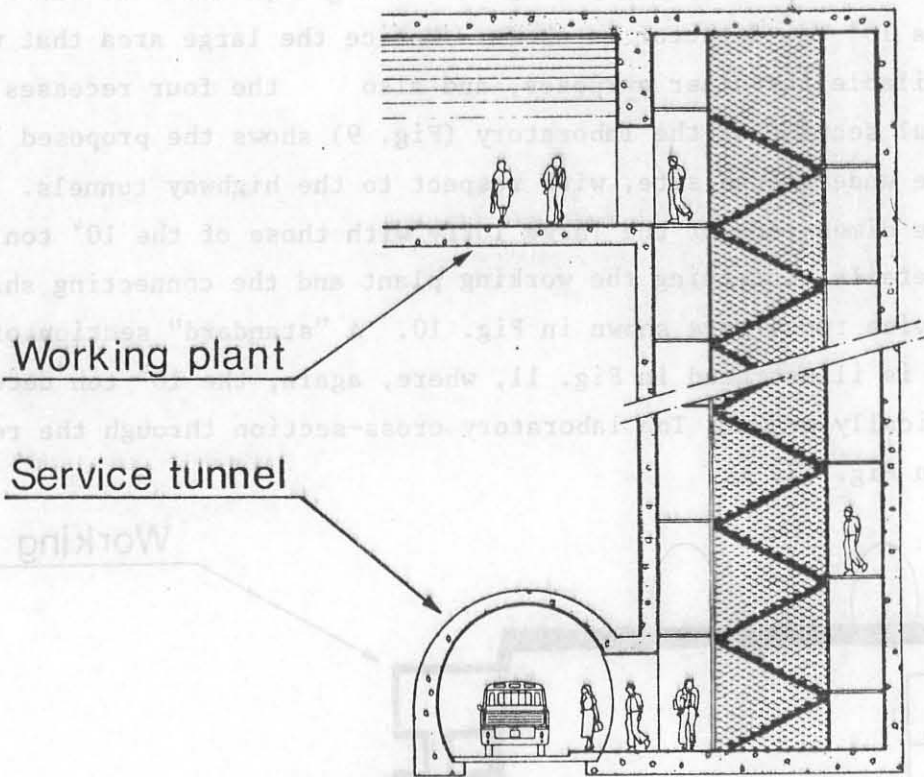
Details of the working plant. Connecting shaft to service tunnel section.
